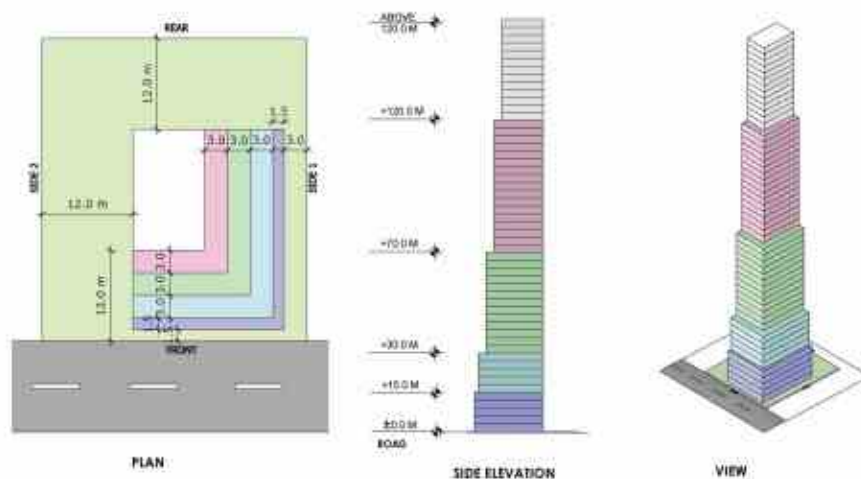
Maximum building envelope for building with height greater than 120.00 M.
